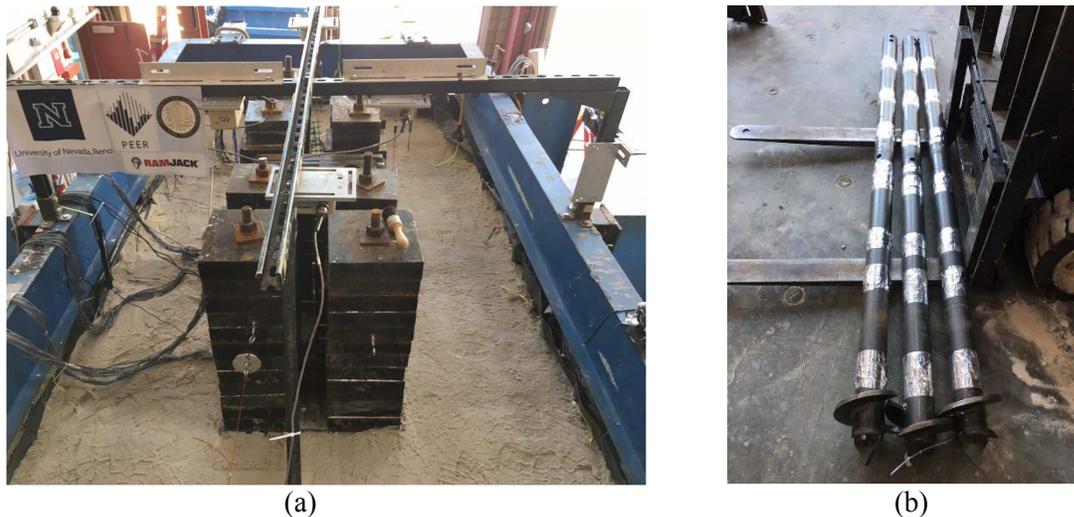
(a) Model shallow foundation configuration for helical pile test before shaking, (b) Helical piles configuration after instrumentation (Helical piles provided by Ram Jack).
